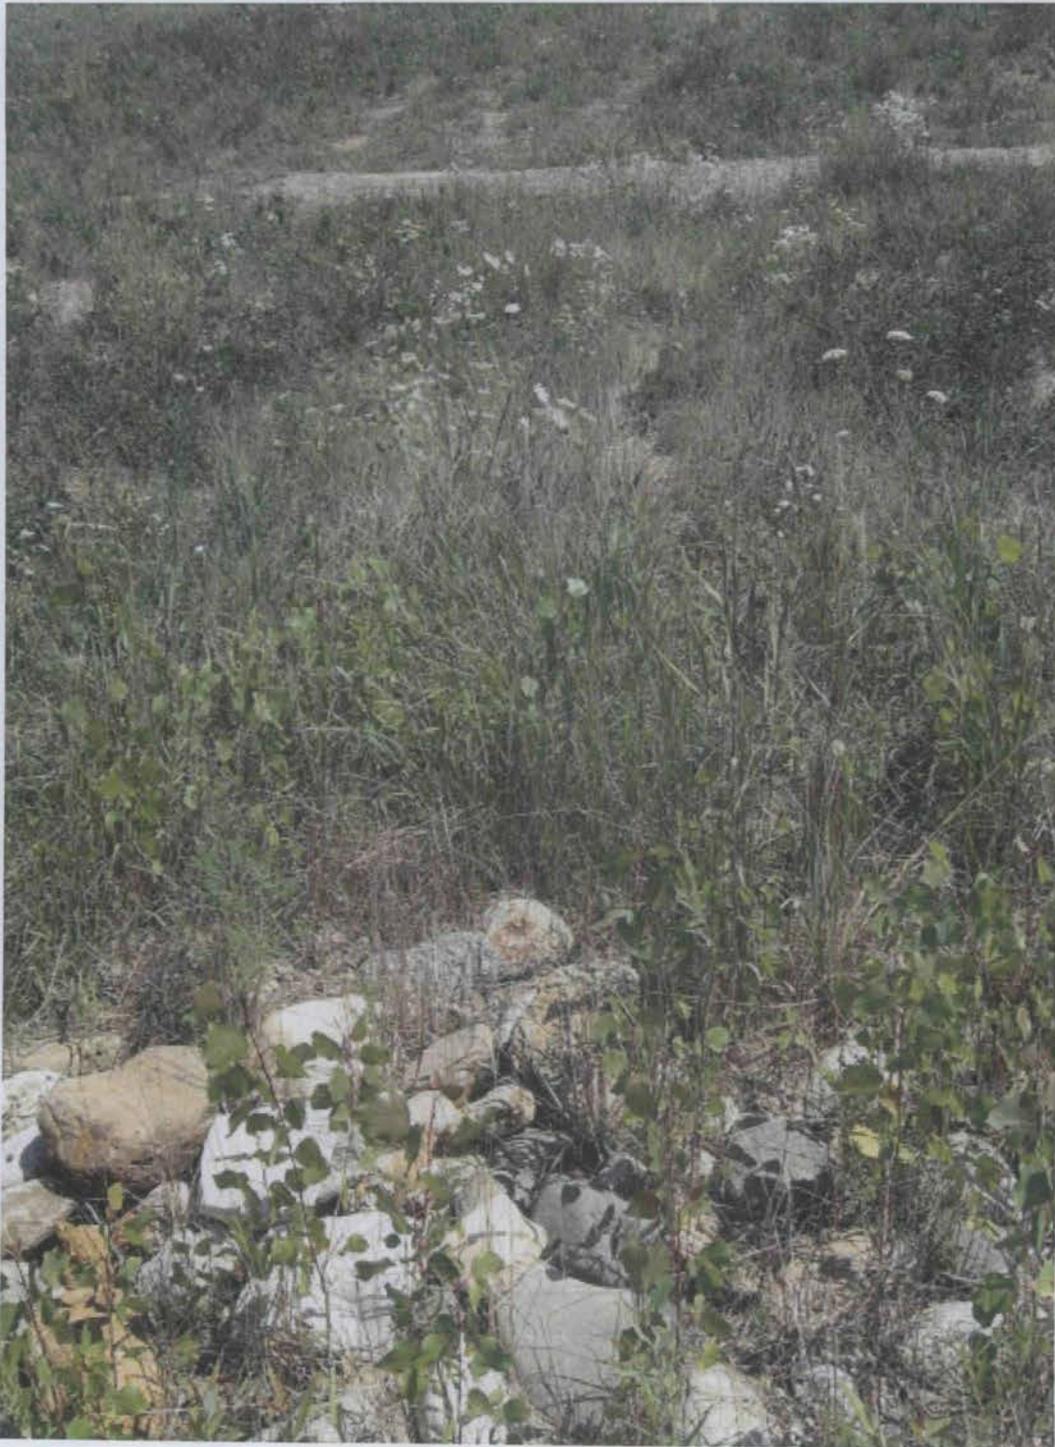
Repair of erosion at drainage net discharge point at western storm water discharge swale
